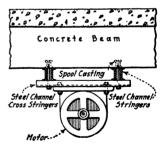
Structural steel stringers, consisting of channels used in pairs, supported from steel inserts.
